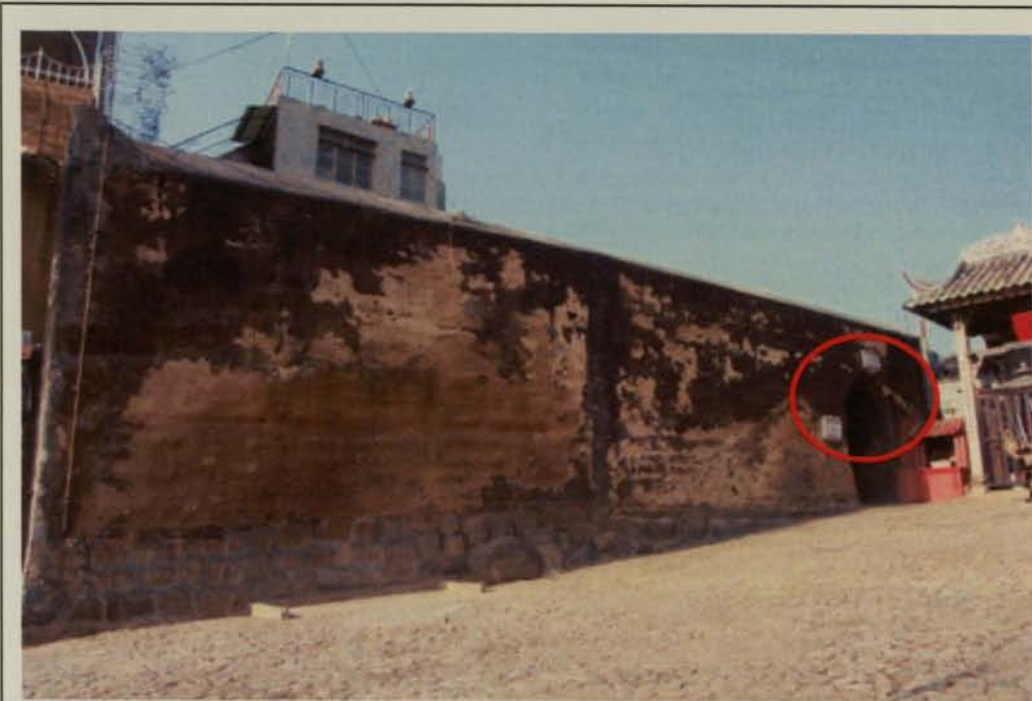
Street signs fixed on the rammed earth wall of the old city wall, which add to the damage caused by weather erosion.
